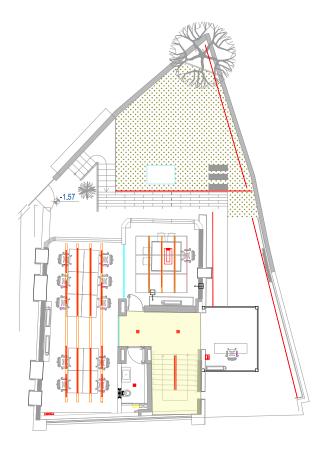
ERKE's Lighting Circulation Areas Layout in the Ground Floor
